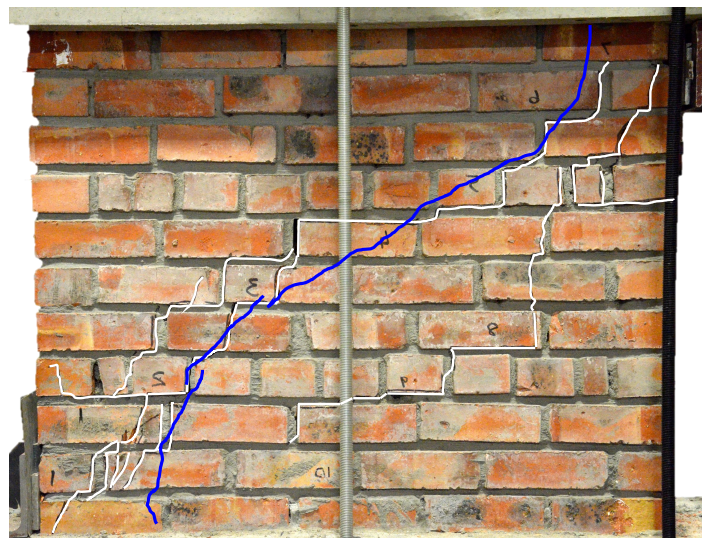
SW-220-15-3, Masonry crack pattern.
